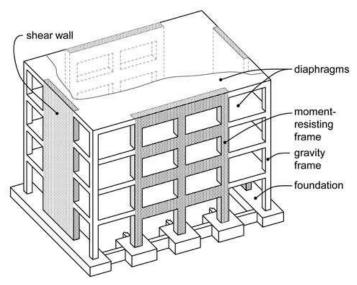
Isometric view of a basic building structural system comprising horizontal spanning elements (diaphragms), vertical spanning elements (walls and frames), and foundation
